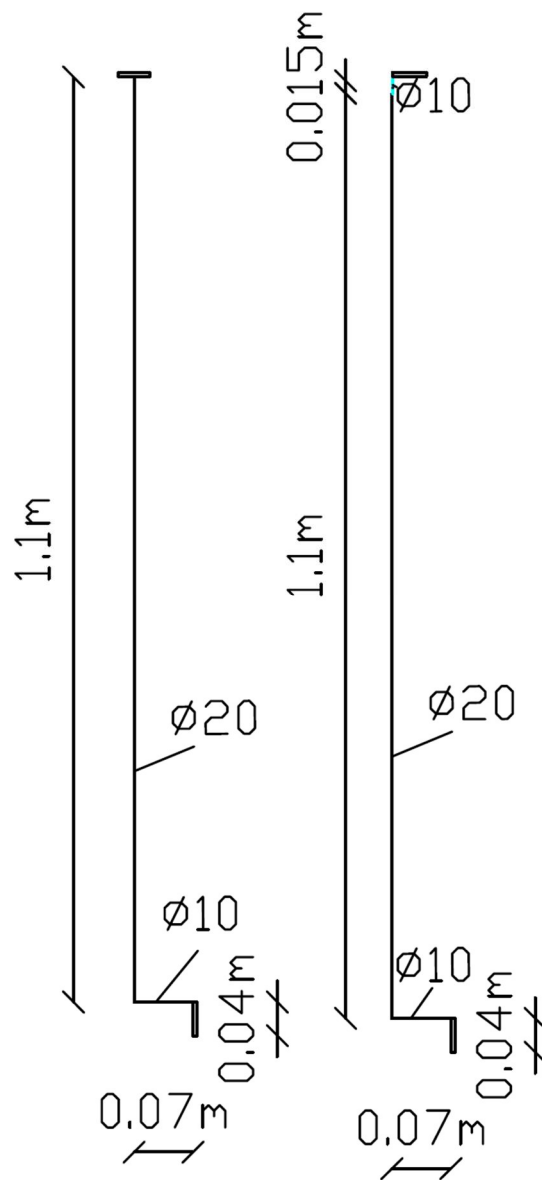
Cross section of living wall 4-3 left, 4-3 right
